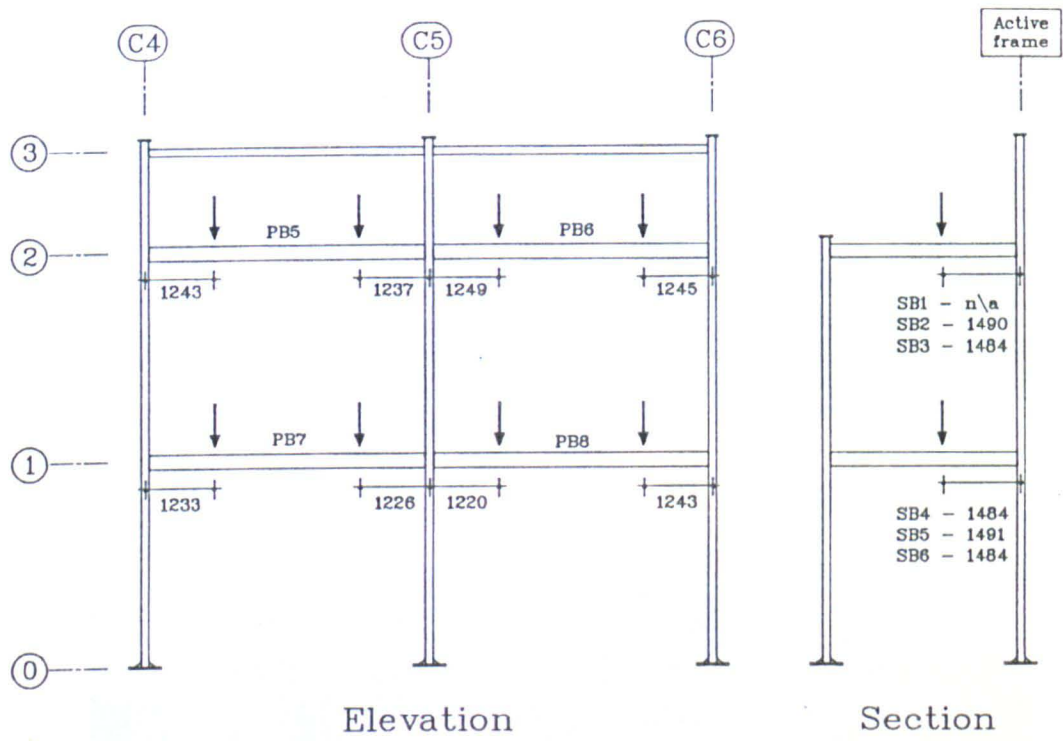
Elevation and section through the frame illustrating the location of the beam loading points.
